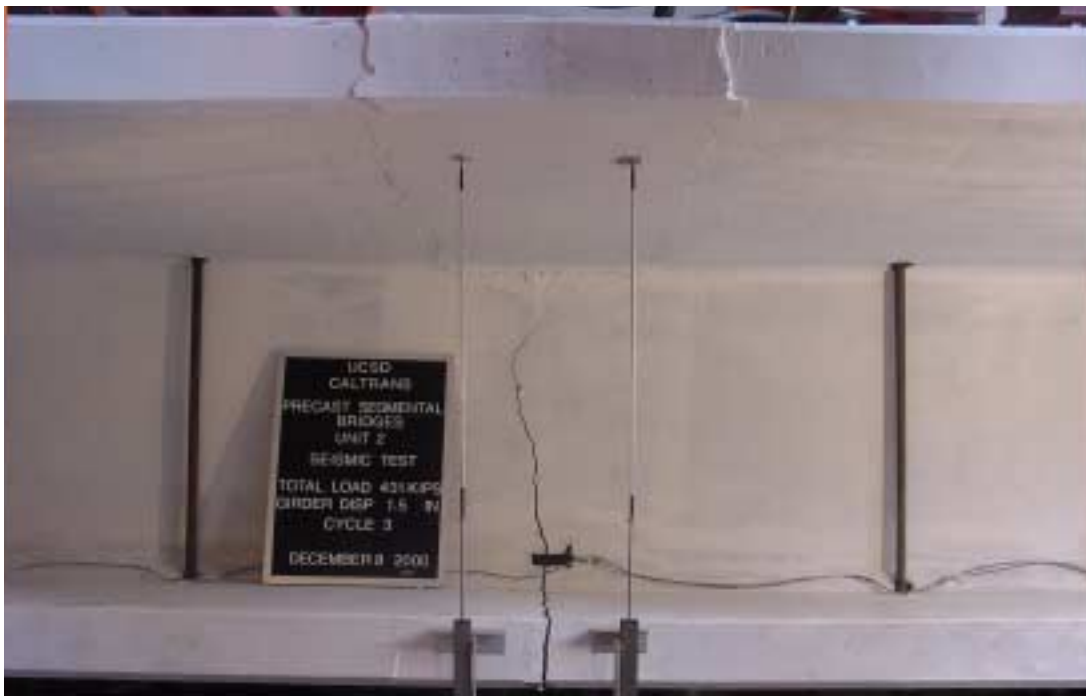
Unit 100-INT-CIP joint J3, West side; $\Delta=+1.5$ in. (38.1 mm)
